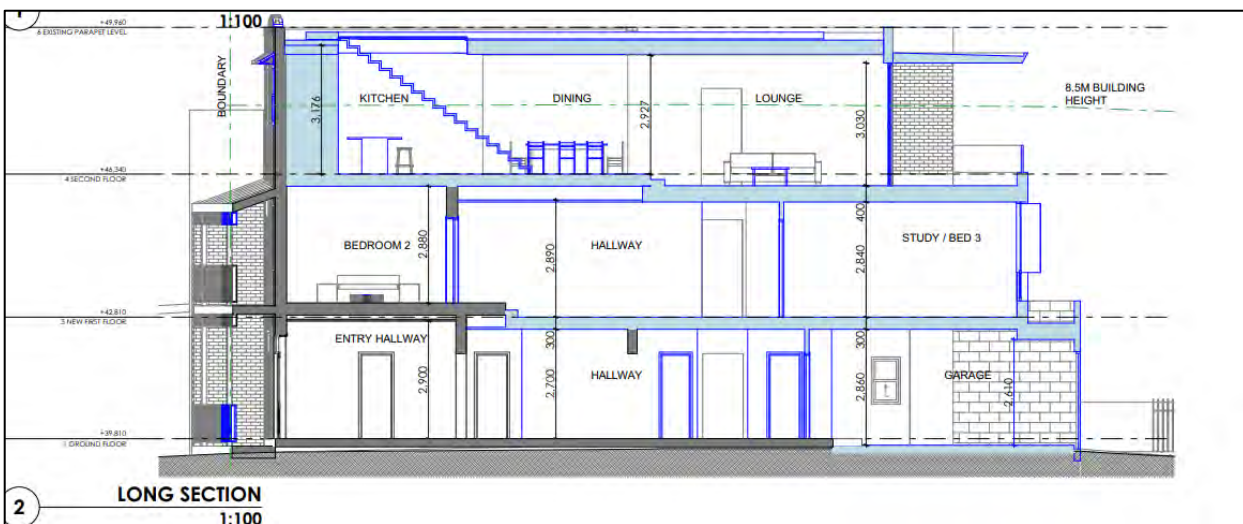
Long Section (Source: Barbara Architecture & Interiors)
